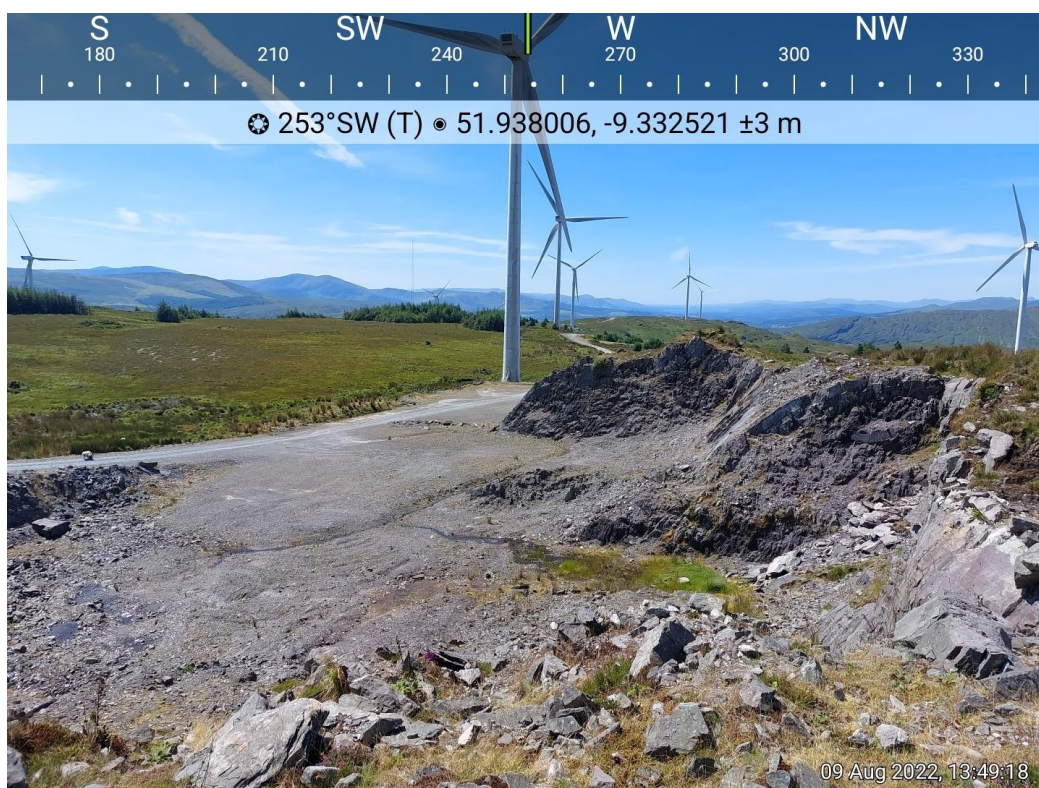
Photo of exiting borrow pit with Gun Point sandstone face.
